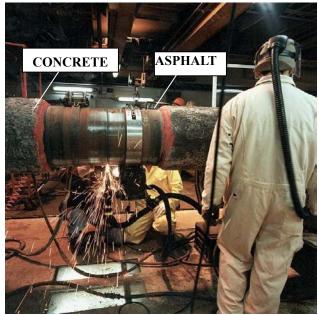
A pipe with concrete weight coating and asphalt enamel being welded on the lay-barge Lorelay. (photo Øyvind Hagen, Statoil).
